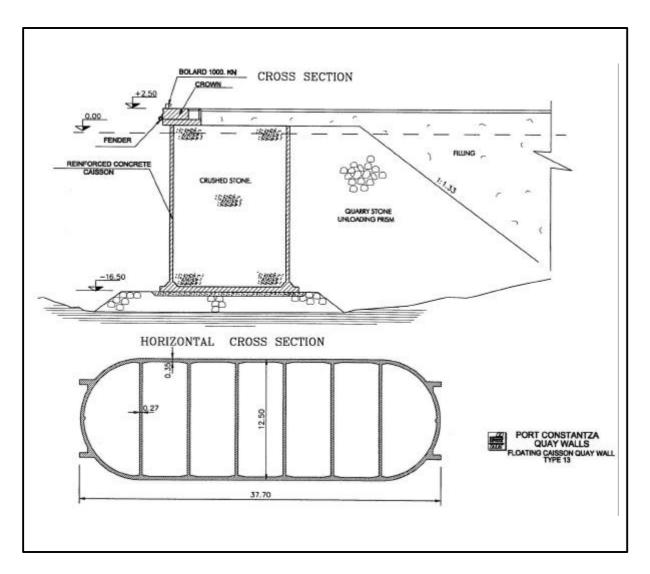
Standard Pier Type Referred to Loading Berth, (Type 13)
